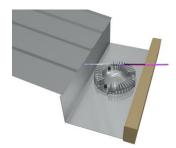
Example of installation of a roof inlet to be welded in a metal gutter
